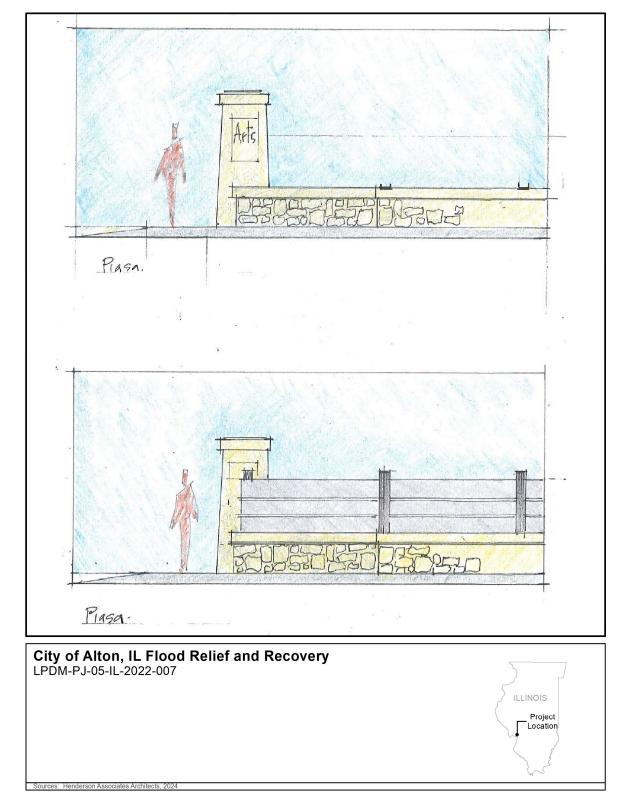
Proposed floodwall along West Broadway at Piasa Street in front of a non-contributing parking lot
